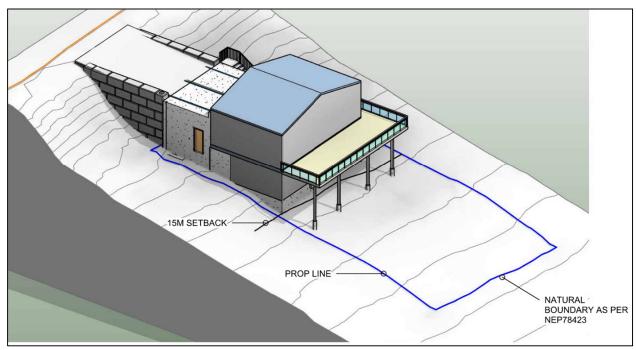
Isometric sketch of proposed development including residential and parking structures, complete with a cantilevered deck system projecting into the designated floodplain setback zone. Taken from WSA Drawing "Crottey Parking Pad and Retaining Walls", issued for Floodplain Exemption Review, Rev A1 05/05/23.
